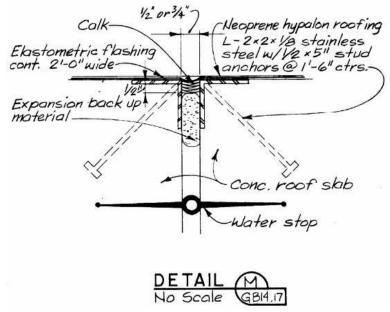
Roof Joint Detail (from Sheet GB-12, 44 of 190, 1982 construction drawings)
